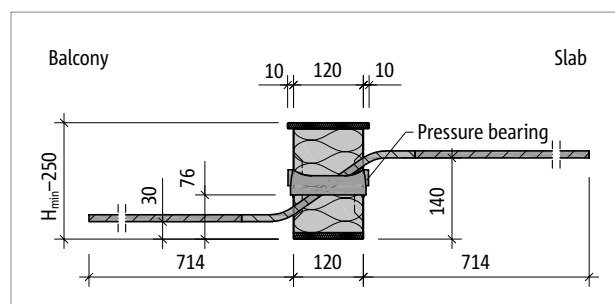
Schöck Isokorb® XT type Q-V10: Product section
